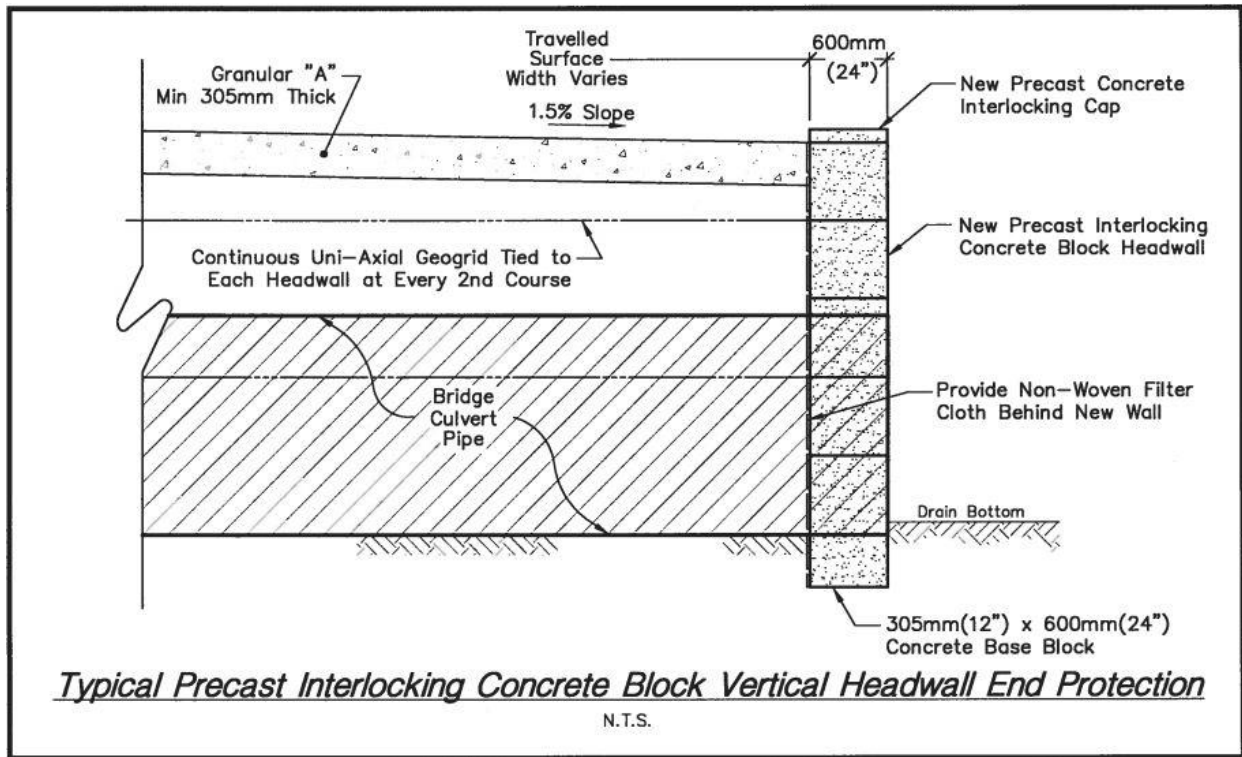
Typical Precast Interlocking Concrete Block Vertical Headwall End Protection Detail
